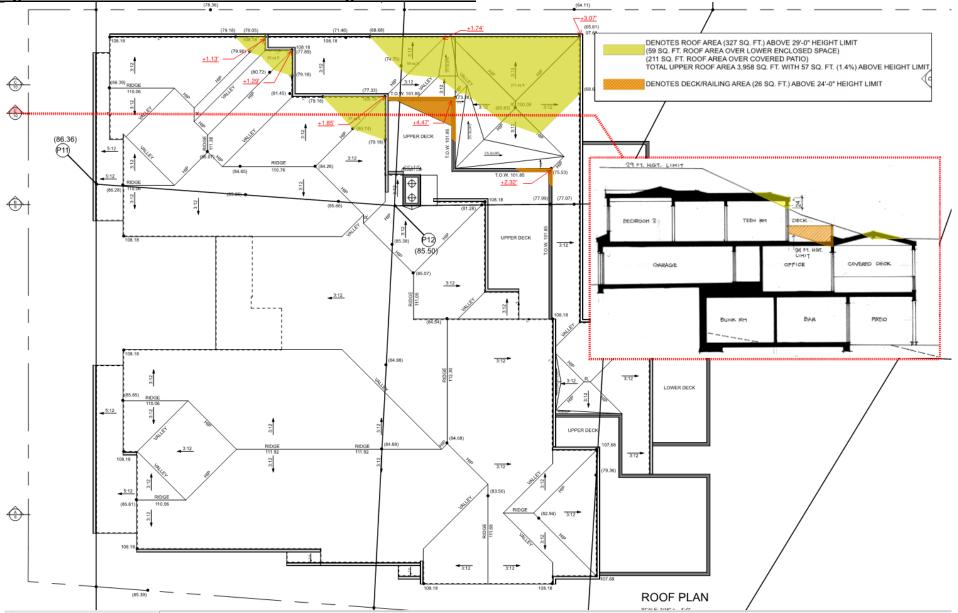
Roof Plan and Section Exhibit - Height Exceedances
